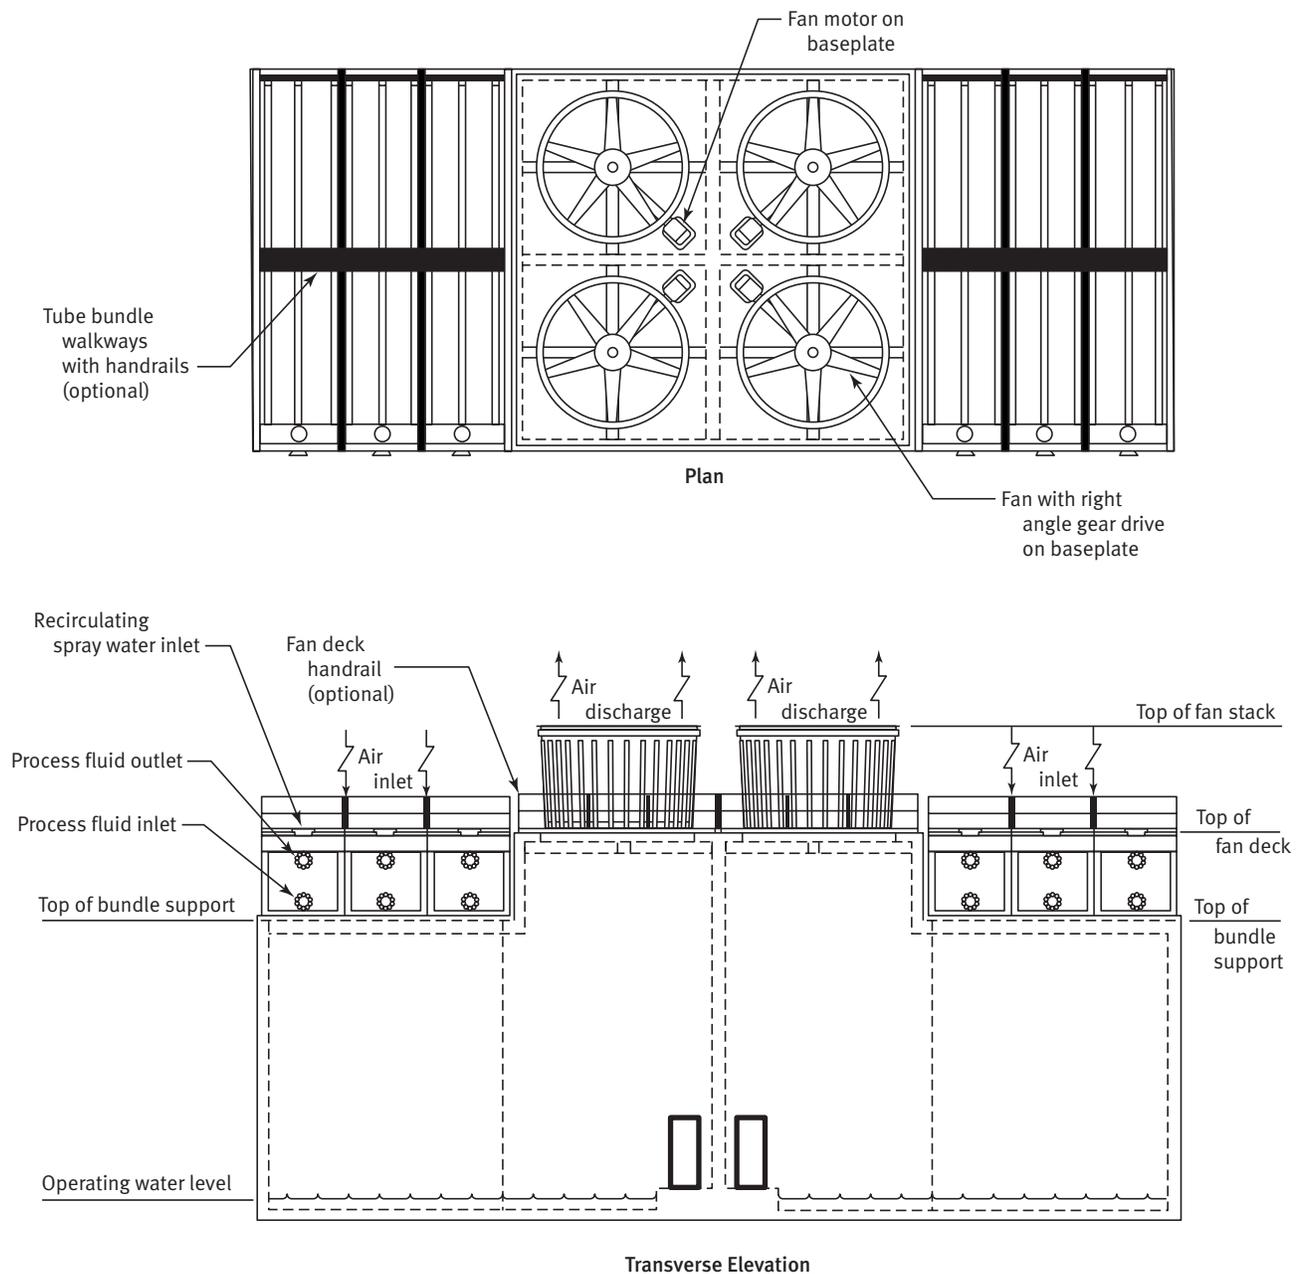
Closed-Circuit Evaporative Cooler — Parallel Flow Design
